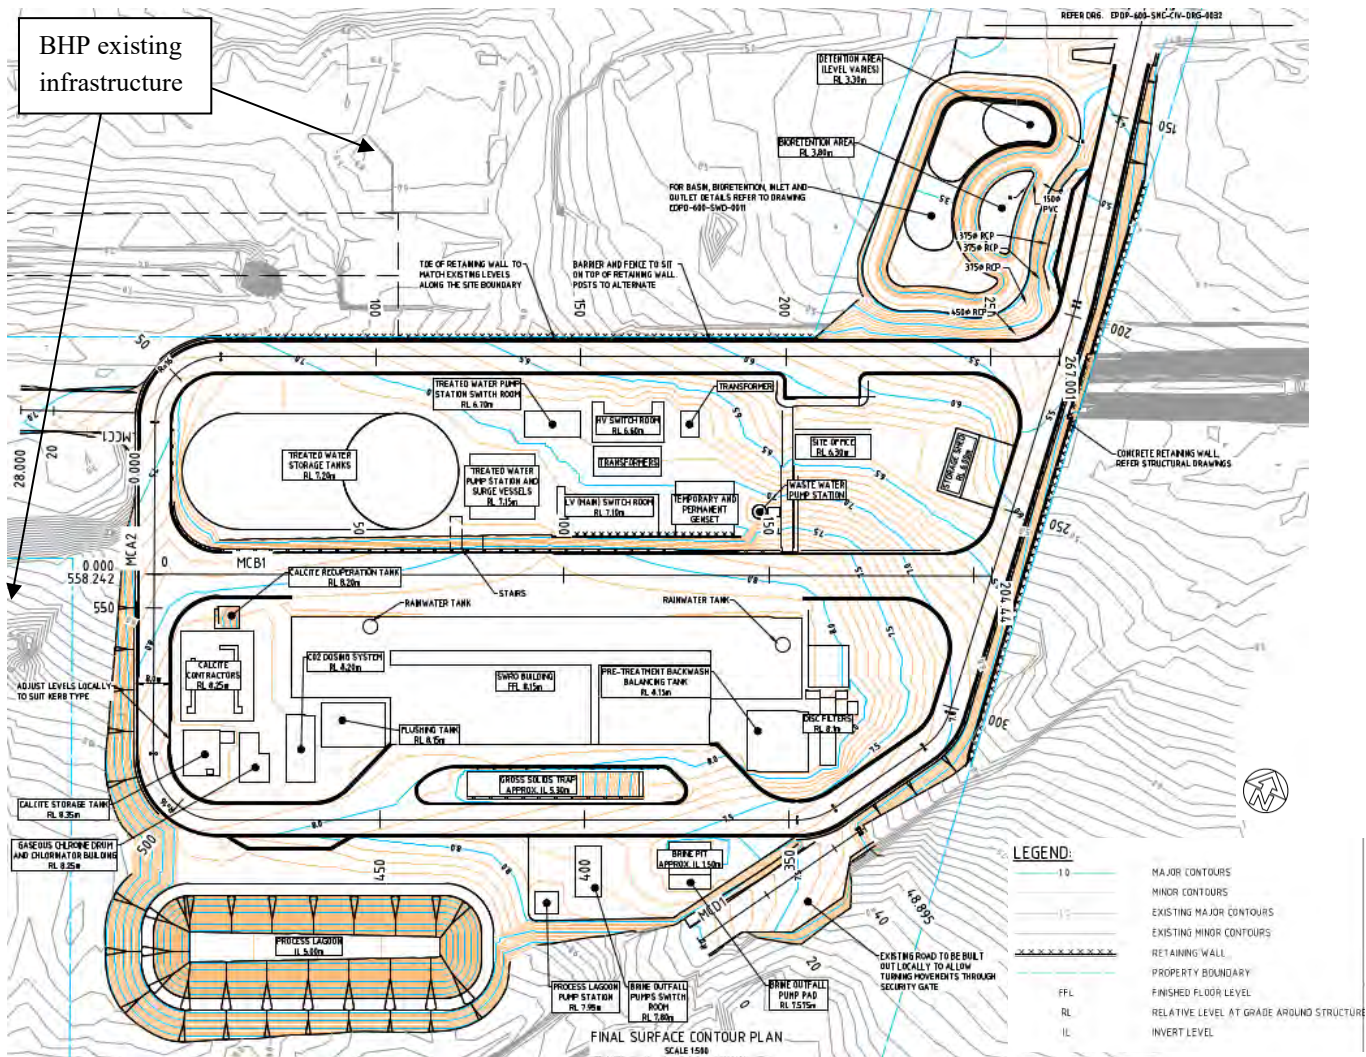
Indicative Civil Earthworks Contour Plan showing existing and proposed site contours (EPDP-600-SMC-CIV-DRG-0031)
